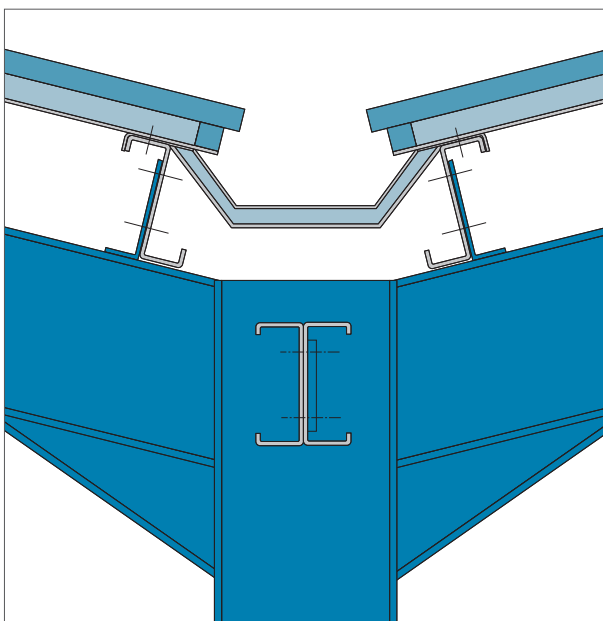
Detail of a spacer beam at a column under the inner gutter
